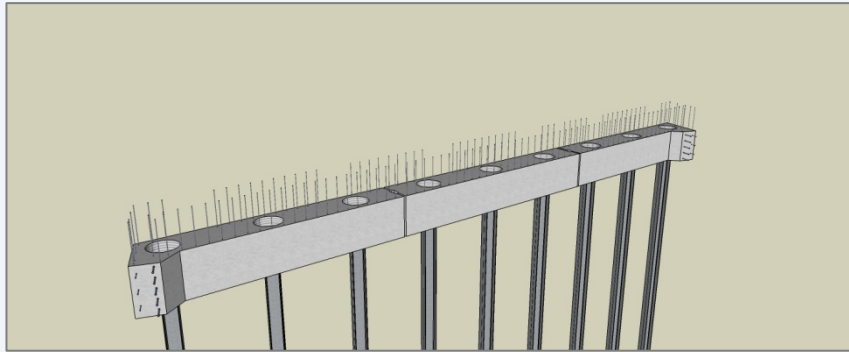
Details of Example Integral Abutment.
